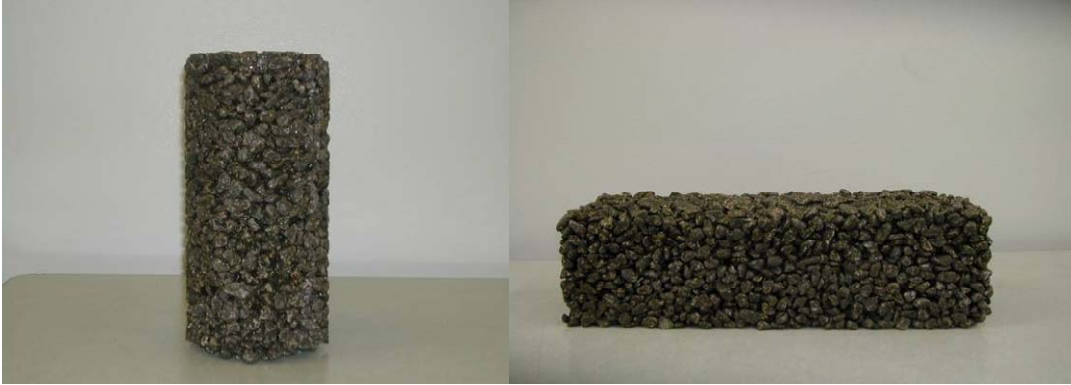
6 in. x 12 in. cylindrical sample and 6 in. x 6 in. x 18 in. beam sample.
